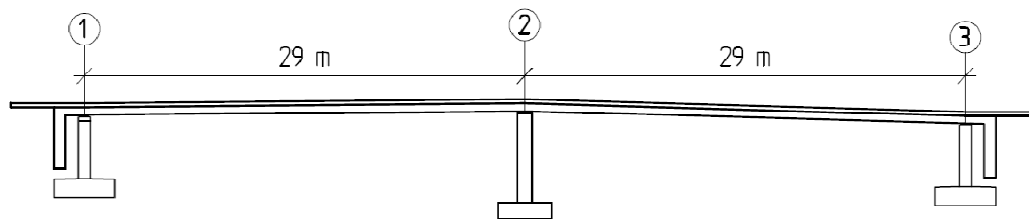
Elevation of bridge 13-799-1 in Gulbranna. Adapted from Batman (2010).
